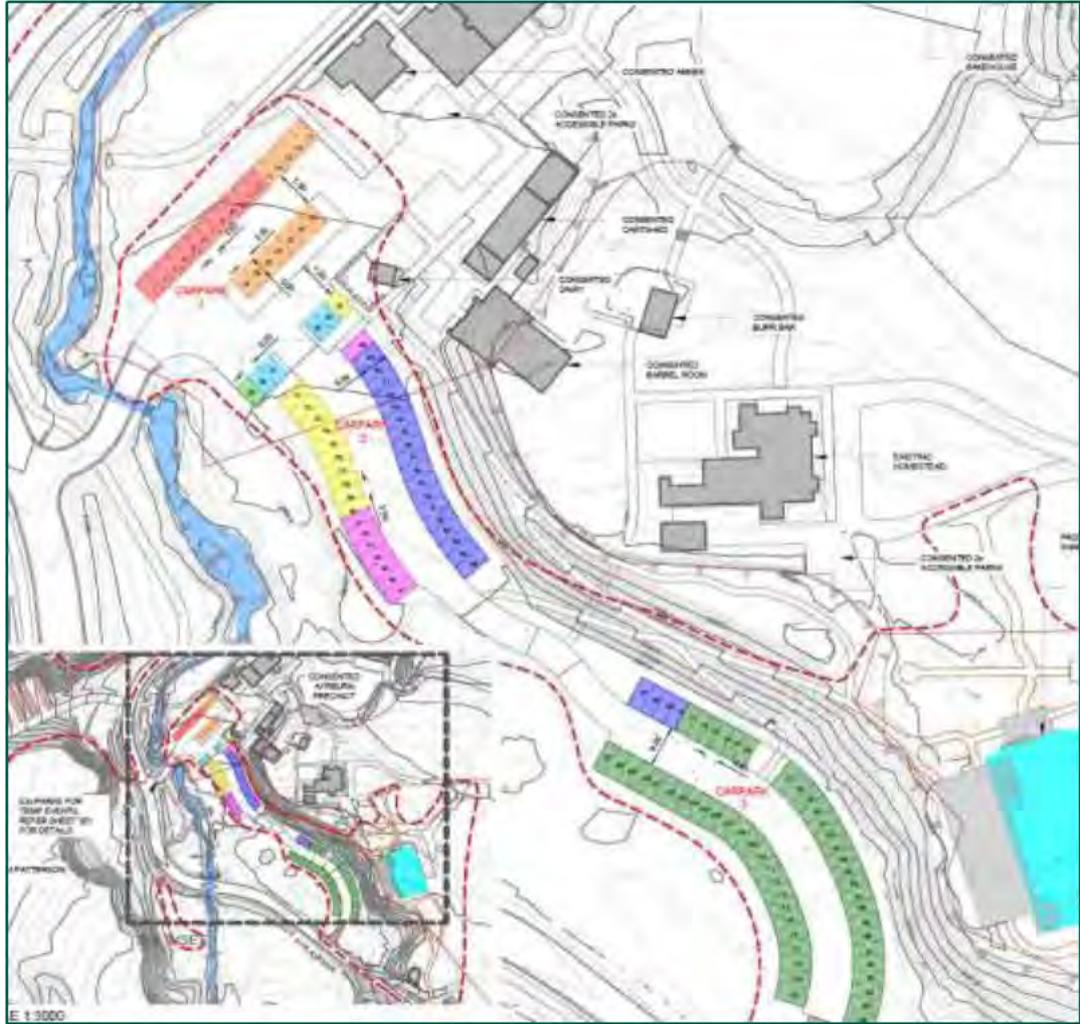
Plan showing carpark areas 1-3. (Source: Engineering Drawings attached as Appendix 5).
